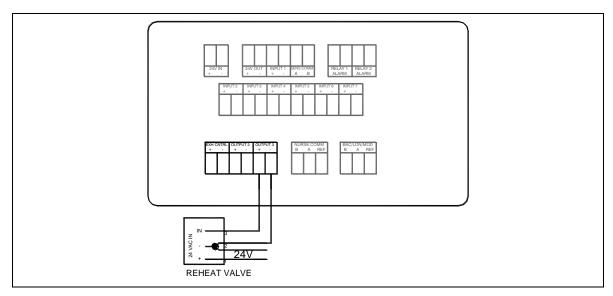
Optional Reheat Actuator Wiring to Model RPC30.
